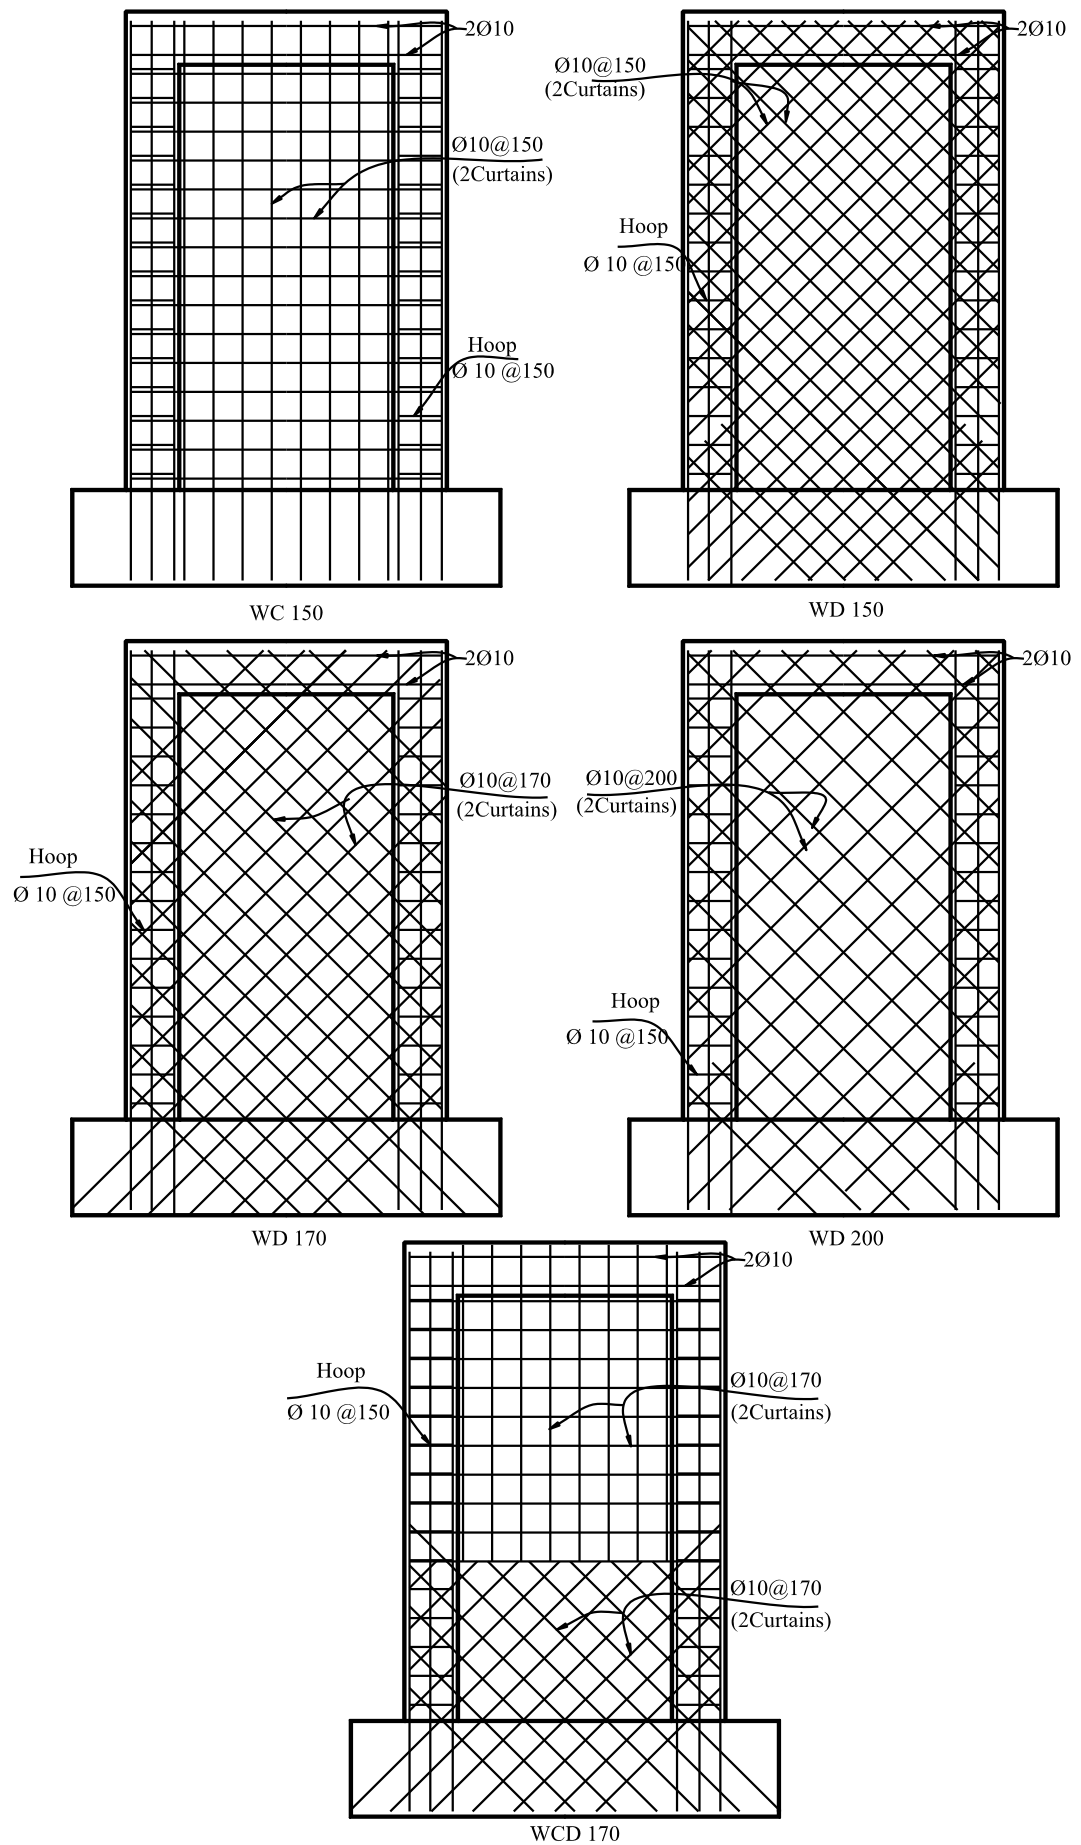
Details of specimens tested by Shaingchin *et al.* (2007)
